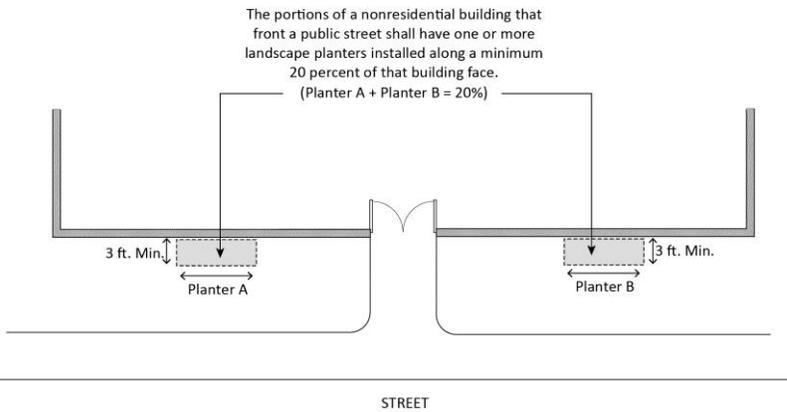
(C): AREAS TO BE LANDSCAPED, BUILDING PERIMETERS
